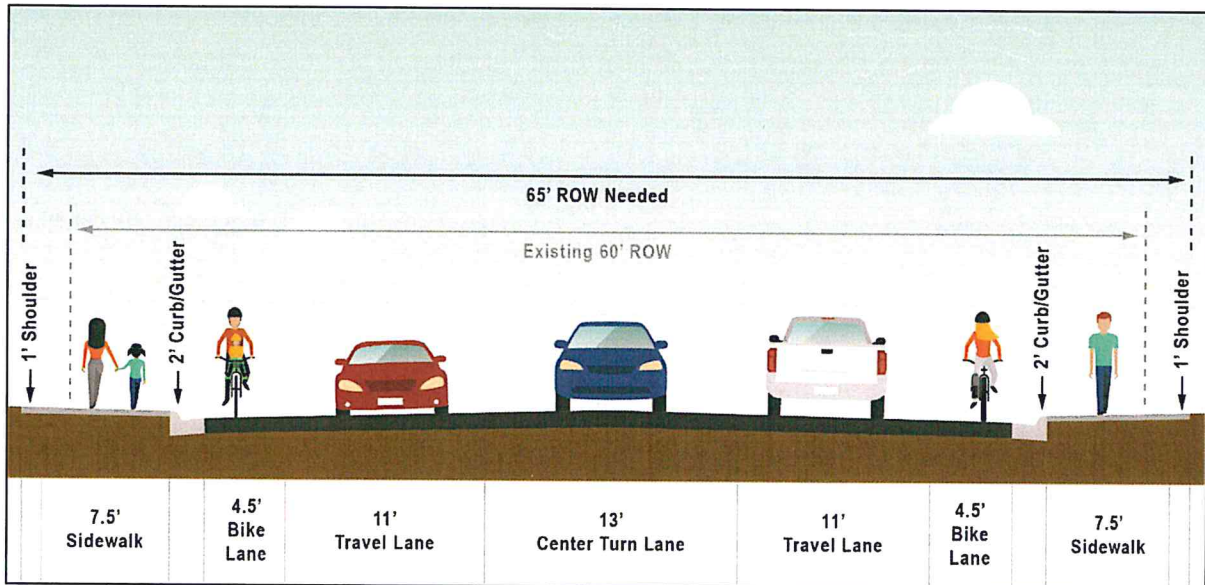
65-Foot ROW Three-Lane Alternative No. 3 – Sidewalk and On-Street Bicycle Lane
